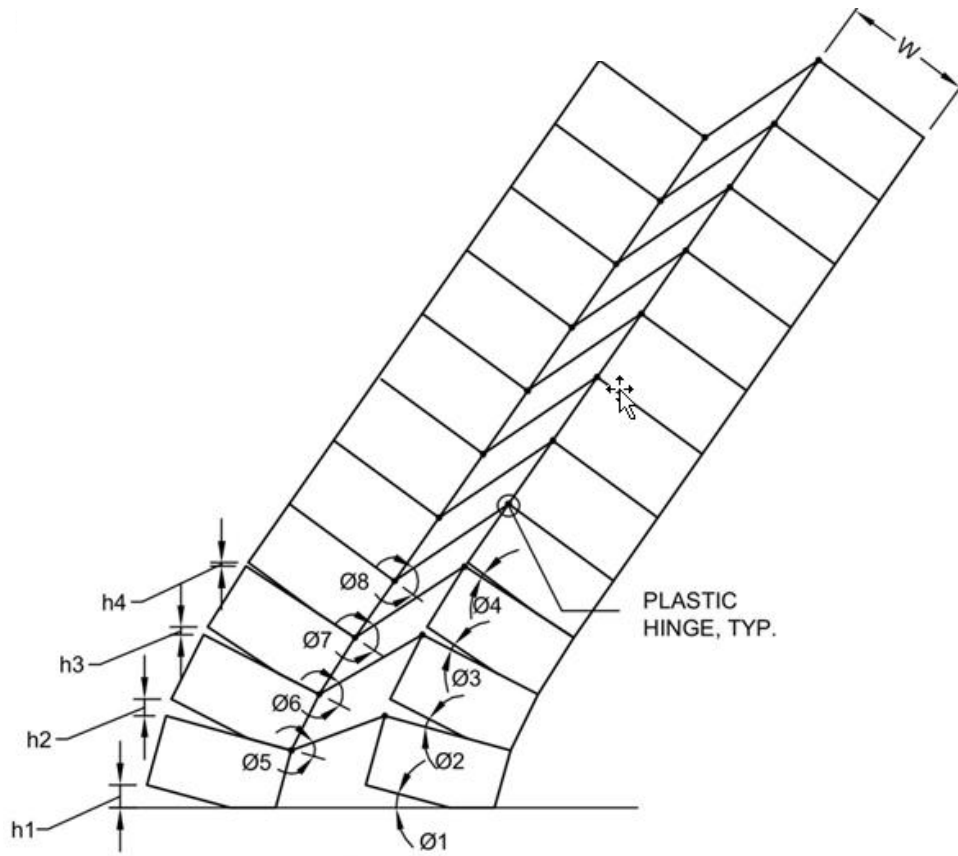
Kinematic Analysis with Four Joint Openings for Walls with Slender Beams
